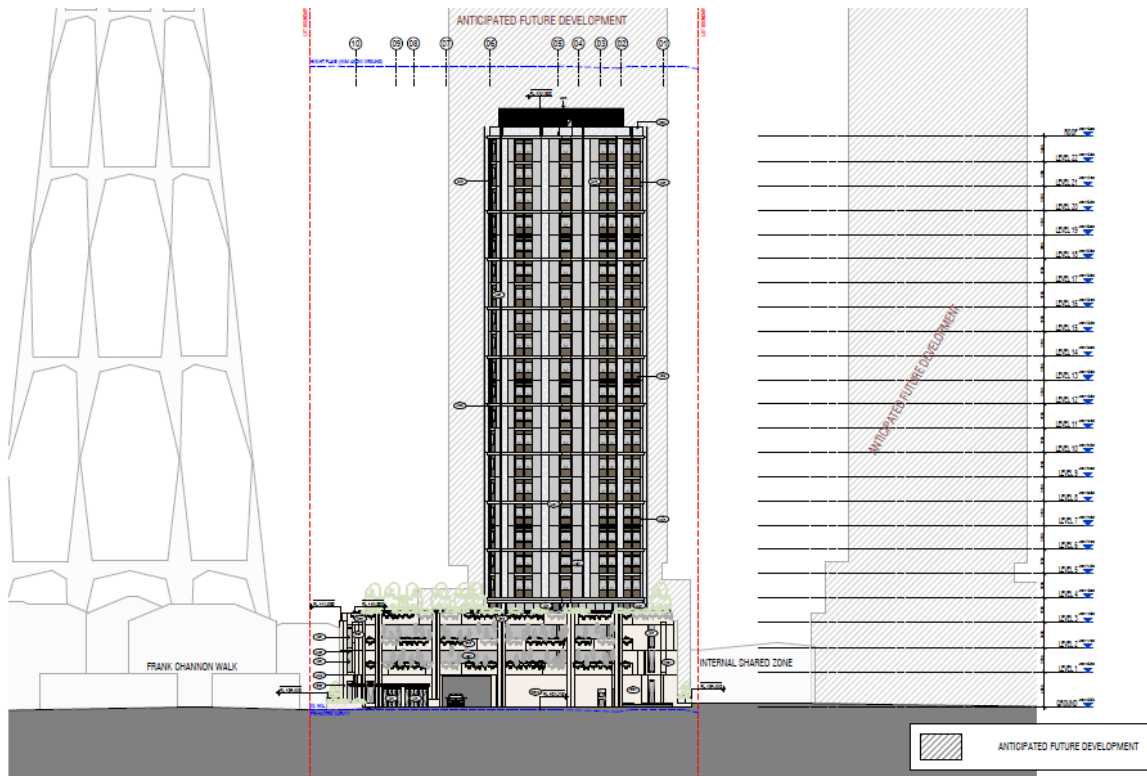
Proposed Site Layout – North Elevation (Source: FK Australia dated 3 December 2025)
